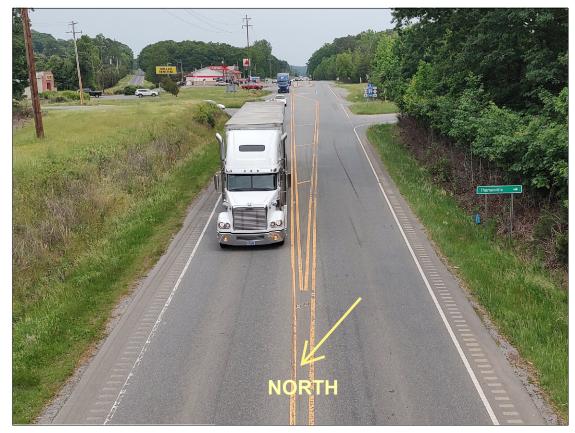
VIEW LOOKING NORTHWEST ALONG US 64 FROM EXISTING BRIDGE DECK.
